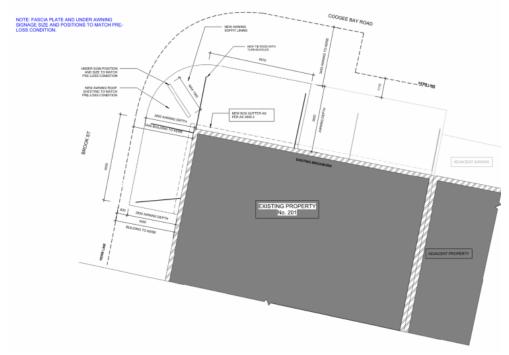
The roof plan of the proposed awning, replacing and matching the existing awning
